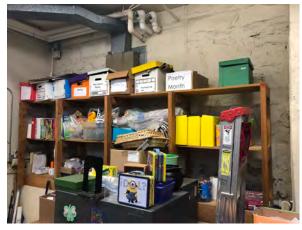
Exposed stone foundation of Borough Hall on east wall of Room 014.
